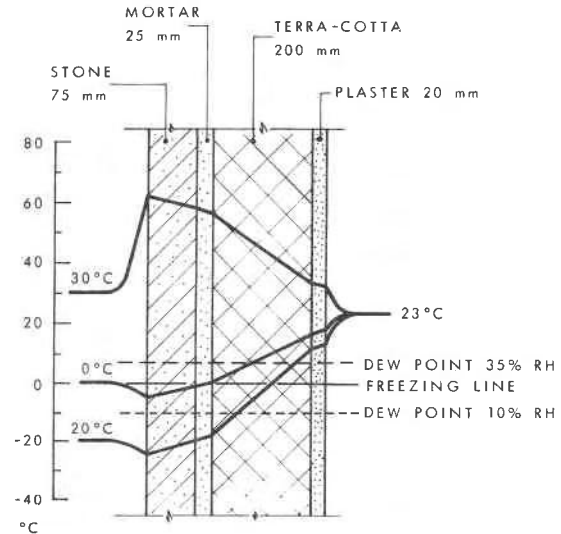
Thermal gradients, winter and summer conditions for masonry wall with no insulation.
